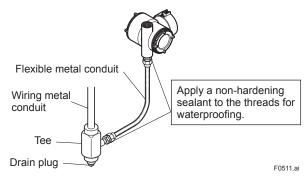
Typical Wiring Using Flexible Metal Conduit
